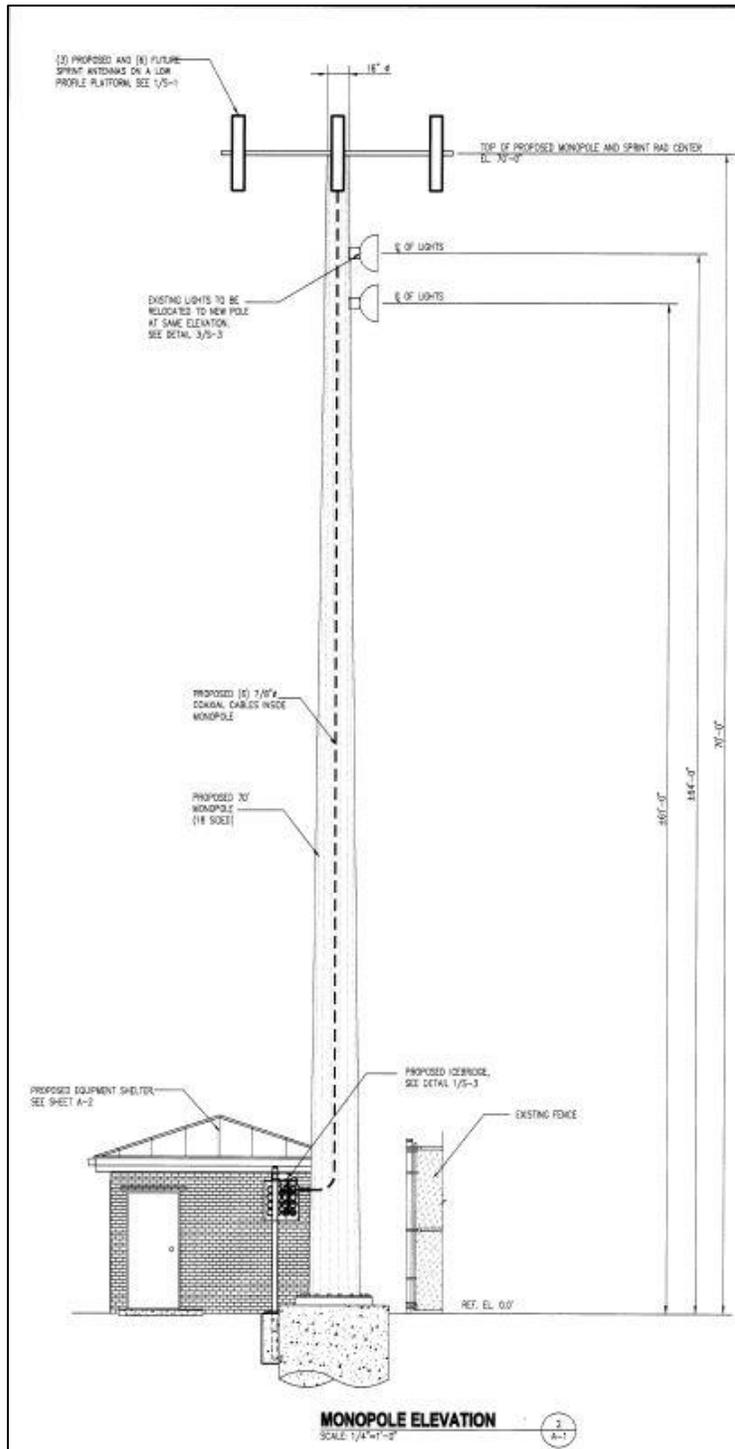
Proposed Monopole and Equipment and Storage Building Elevation Drawing
